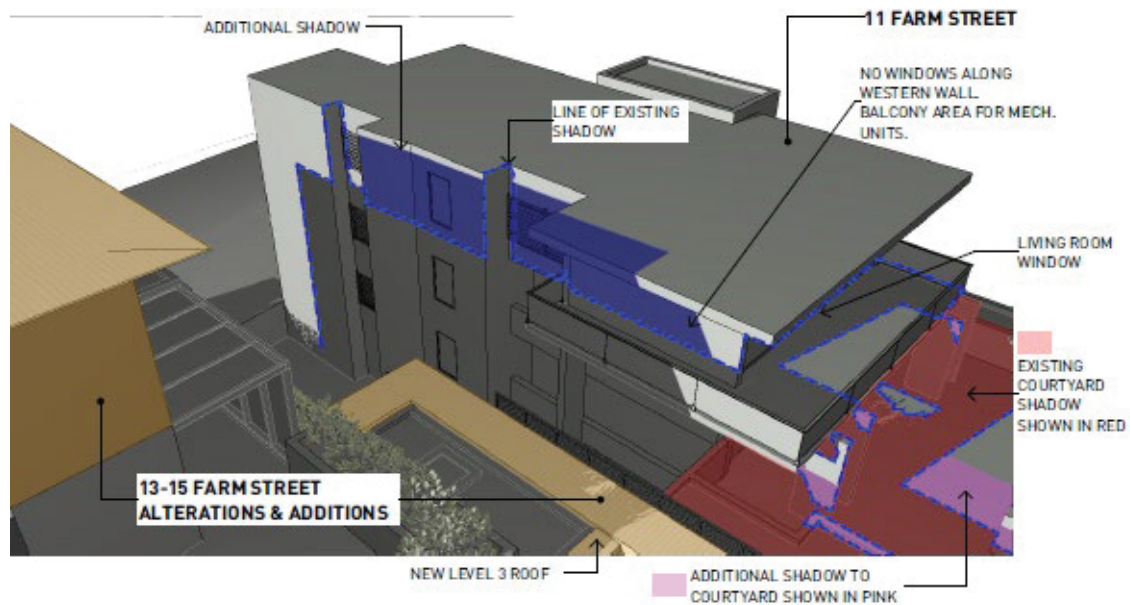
Additional overshadowing onto 11 Farm Street at 1pm.
